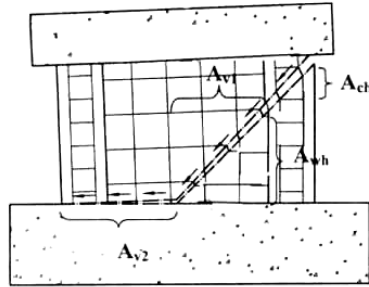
Rebars cut by diagonal and horizontal shear crack
